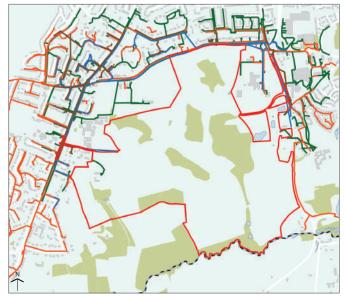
Plan showing existing network of water, gas, electricity and telecom services present around the site
